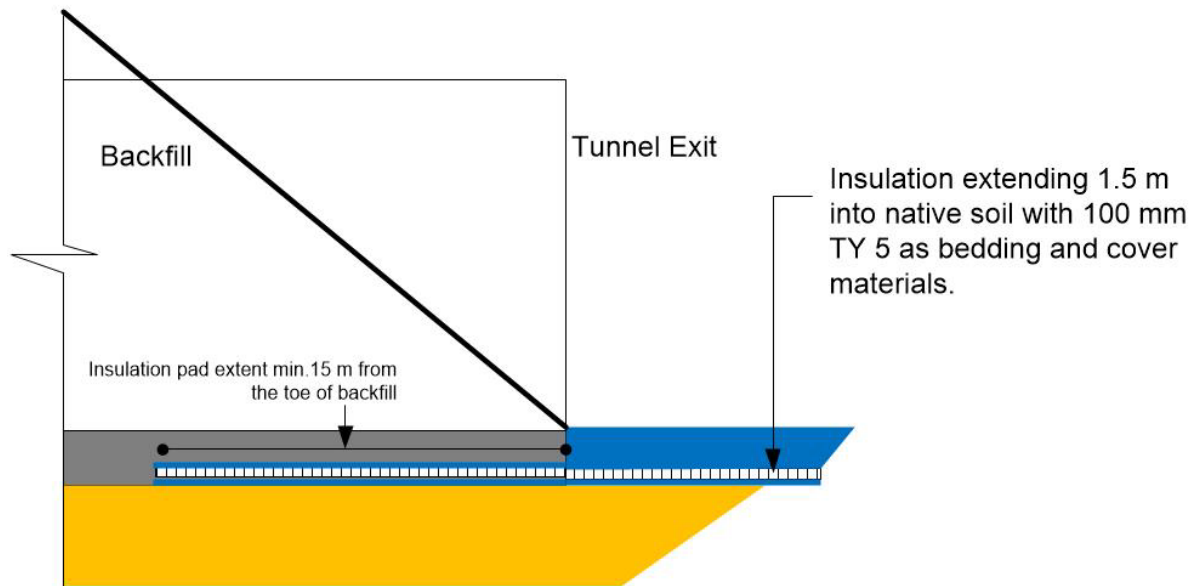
Insulation Pad Configuration (Longitudinal Section) for Load-out Tunnel Segment near the Exit
